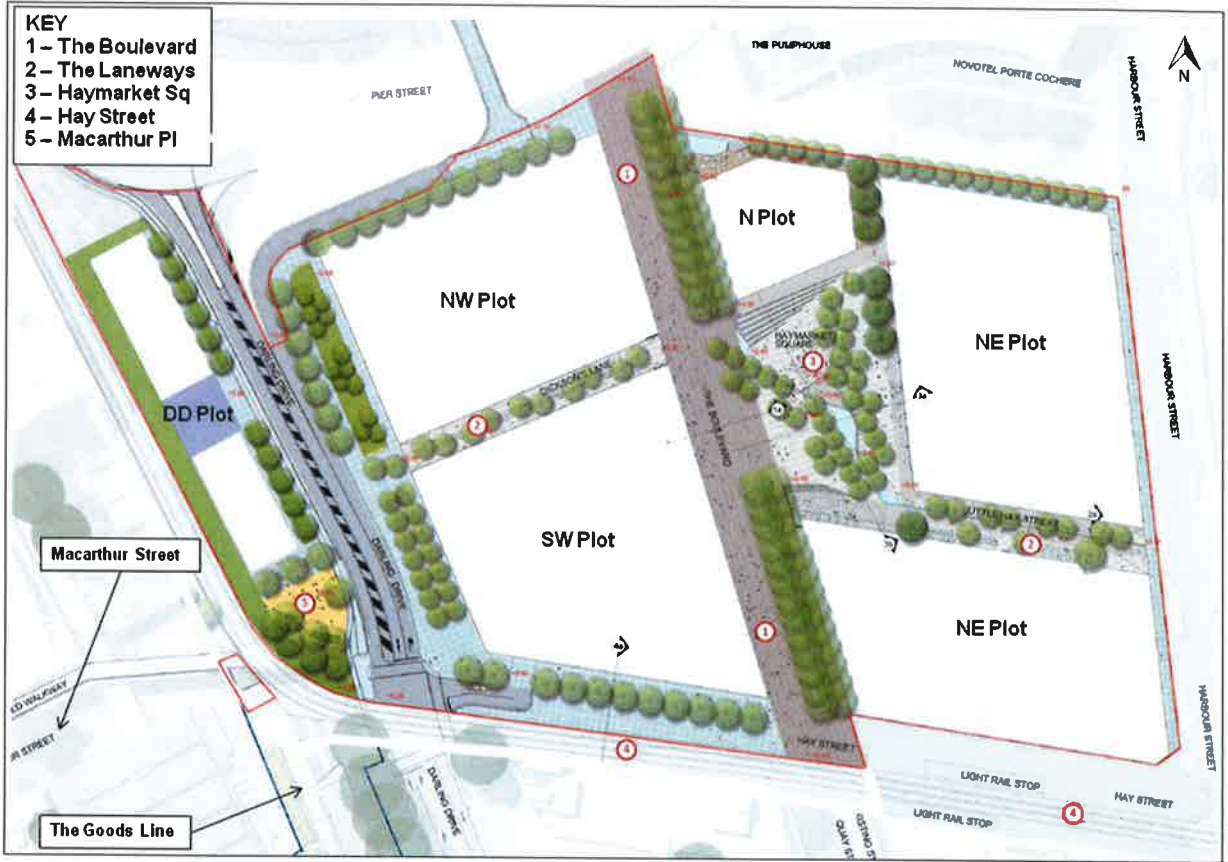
Darling Square (formally known as the Haymarket) Concept Proposal Layout. (source: Applicant's modification application)
